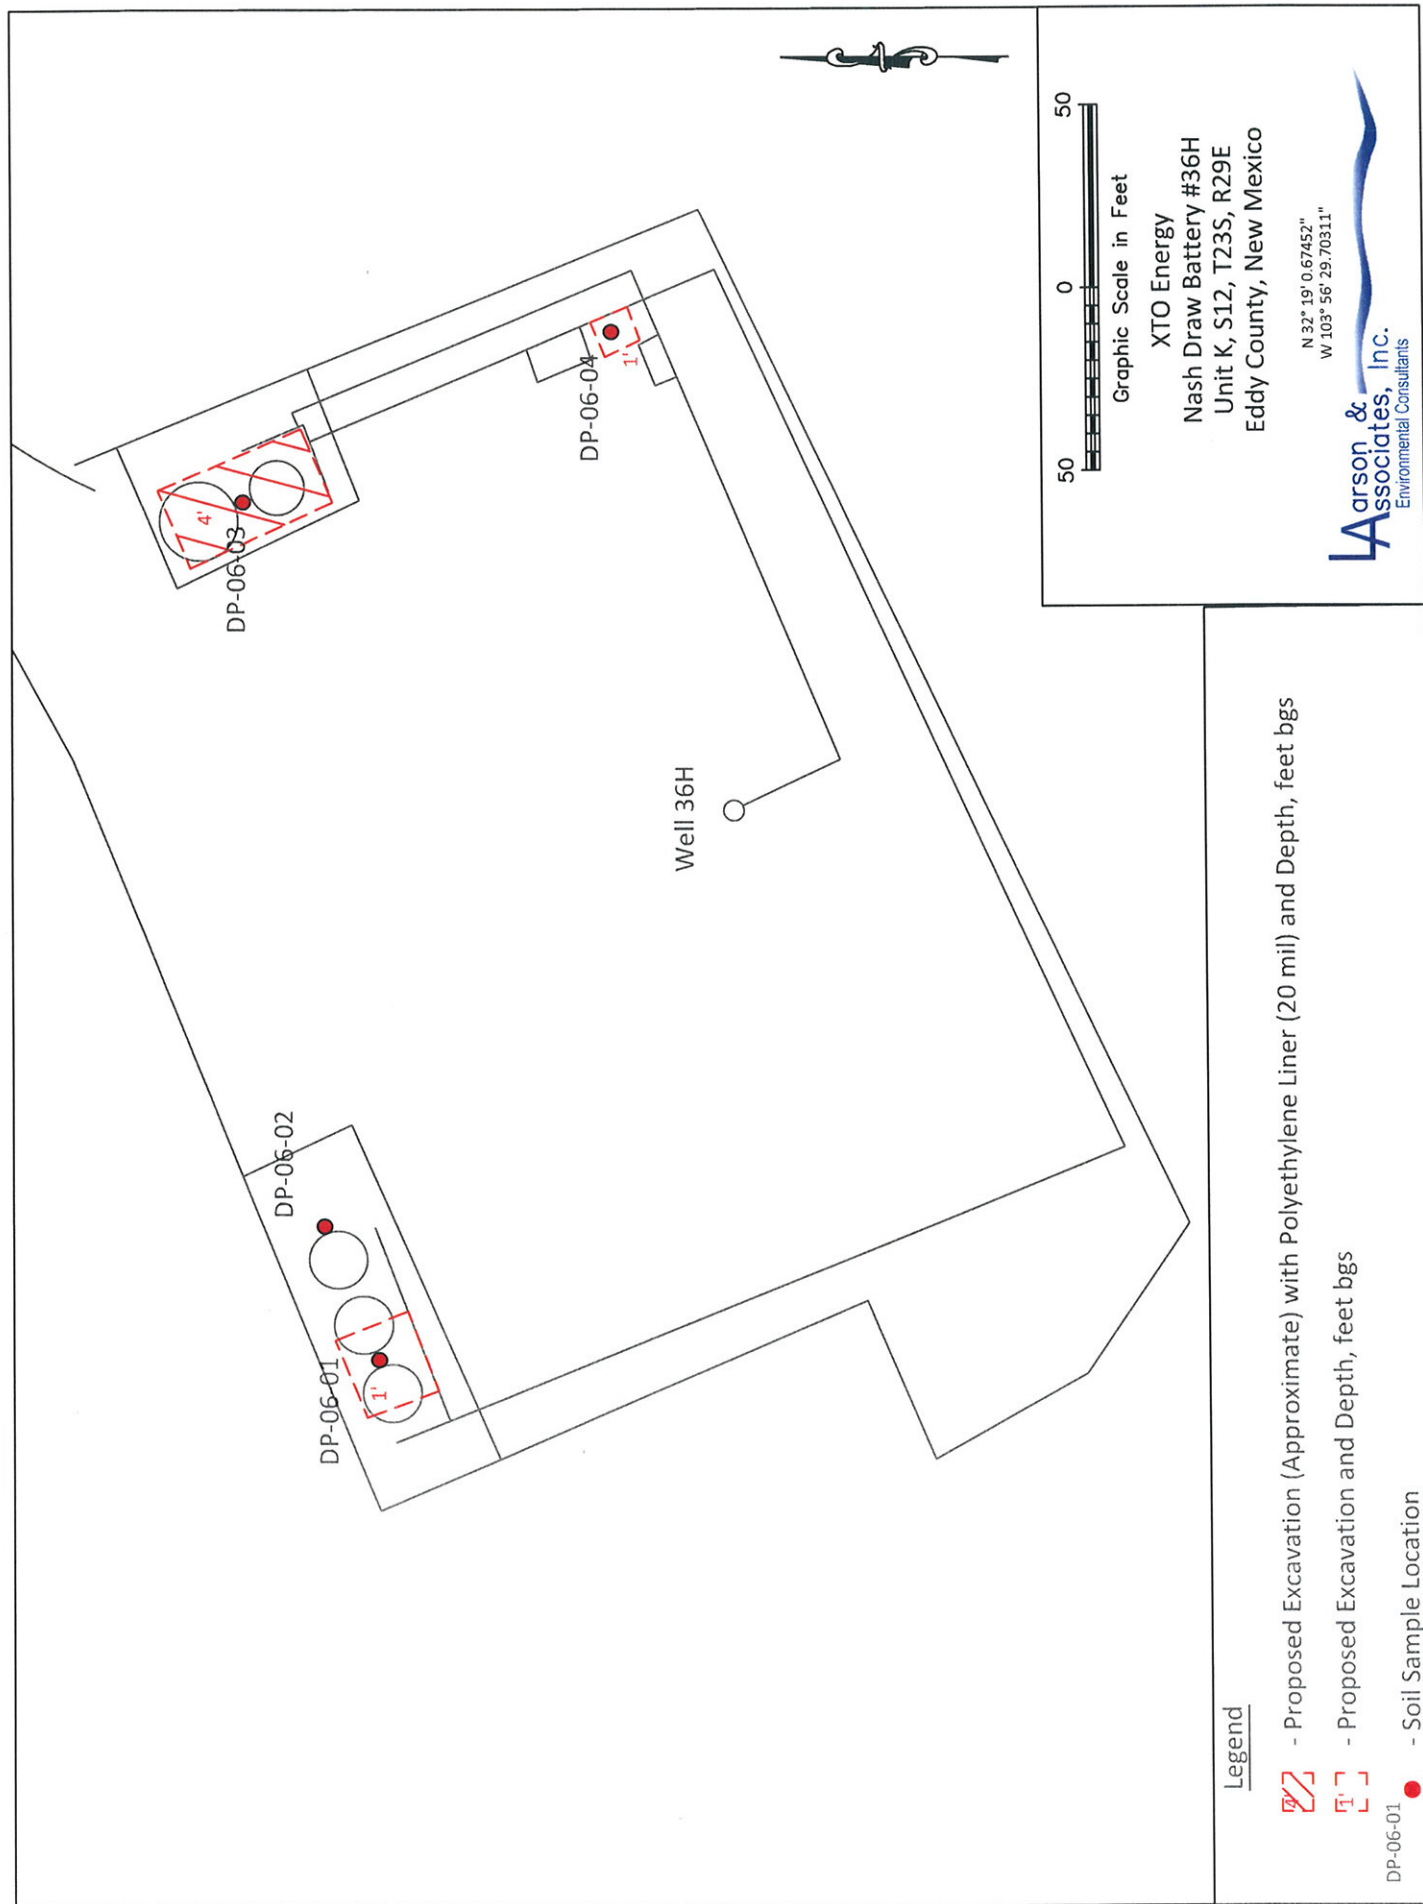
Site Map Showing Soil Sample Locations, Proposed Excavation Area and Depth
